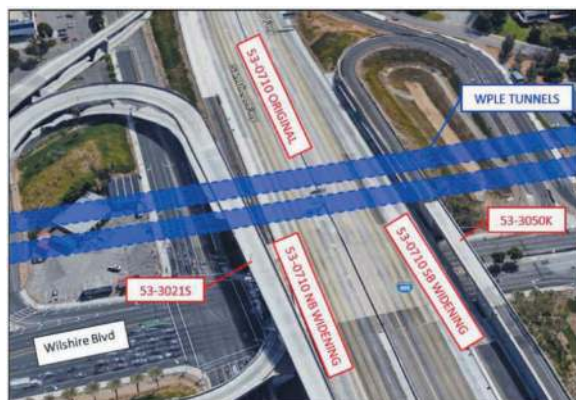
I-405/Wilshire Boulevard intersection looking south.
